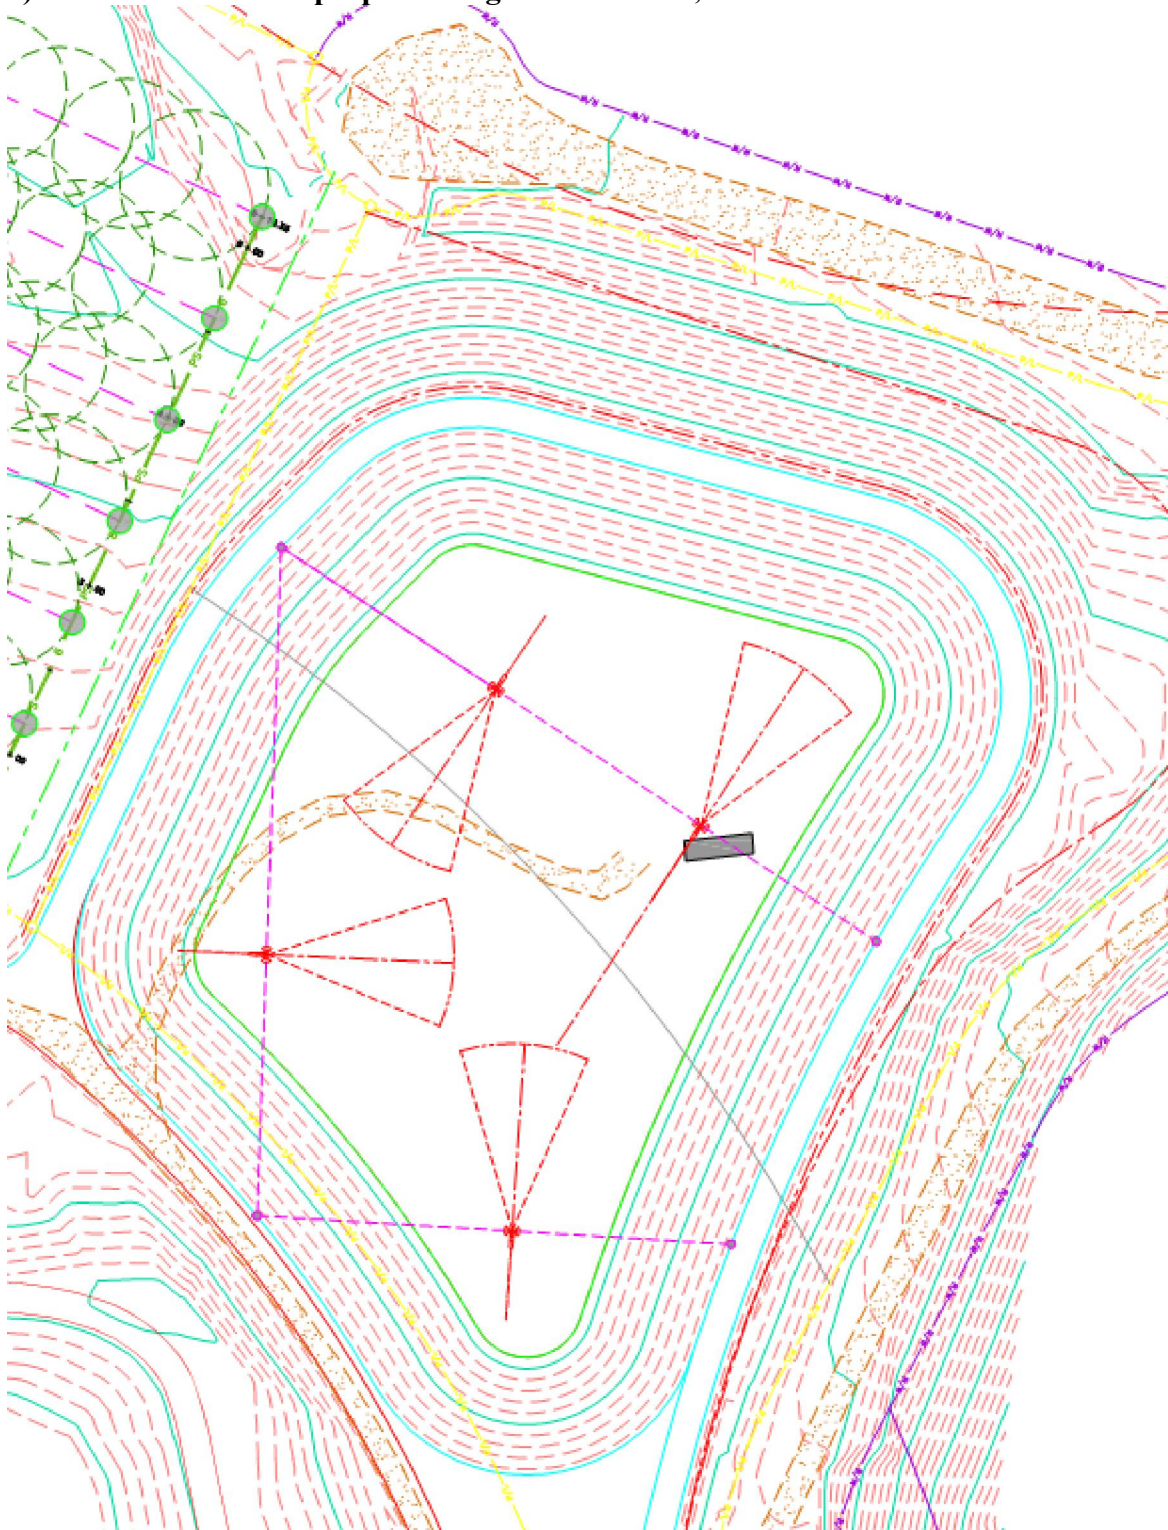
Proposed Aerator Installation, Proposed Lagoon Cell No. 5, T4
